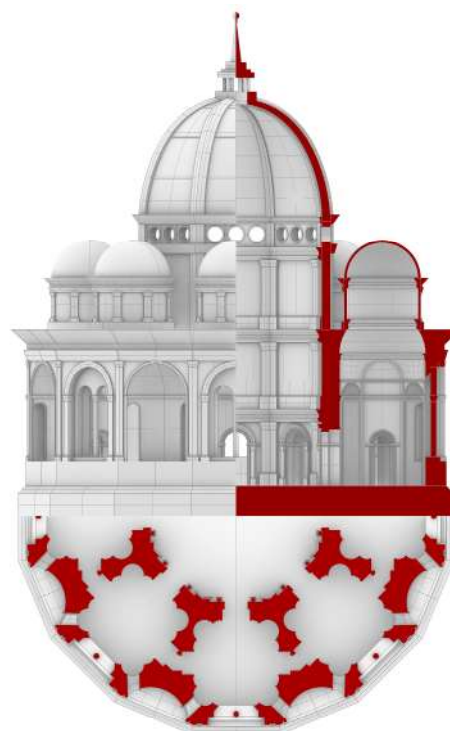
Plan, section and elevation (1:500) of the solution derived from the bird's-eye view.
